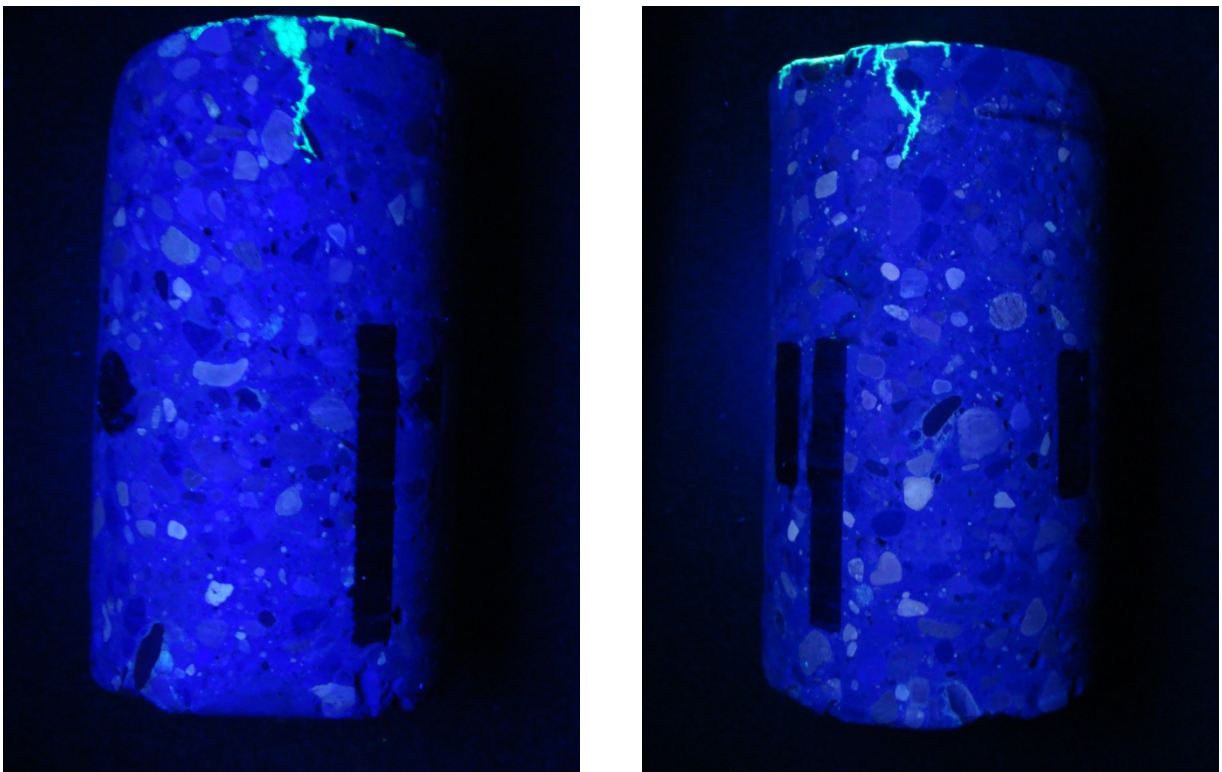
Core SLS1 (left) west elevation; (right) east elevation
